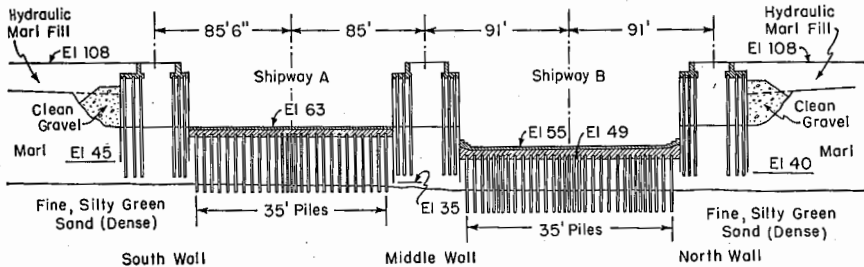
CROSS SECTION THROUGH TWO SUBMERGED SHIPWAYS.
